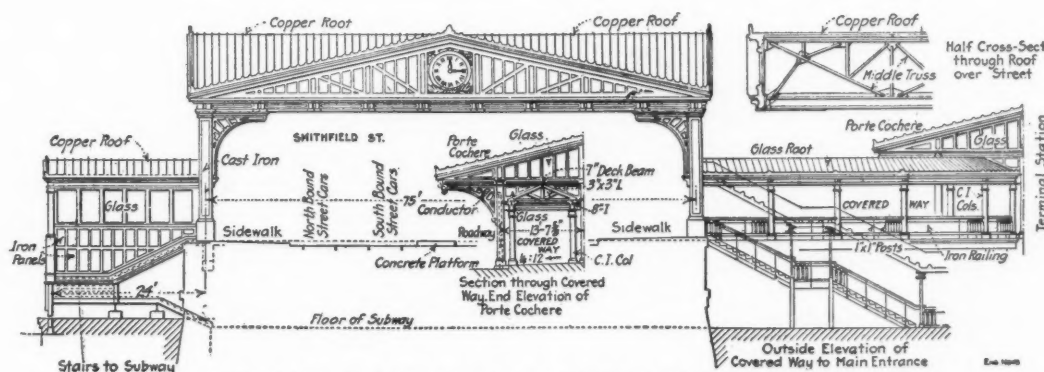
SECTIONAL ELEVATION OF FACILITIES TO PASSENGER STATION
